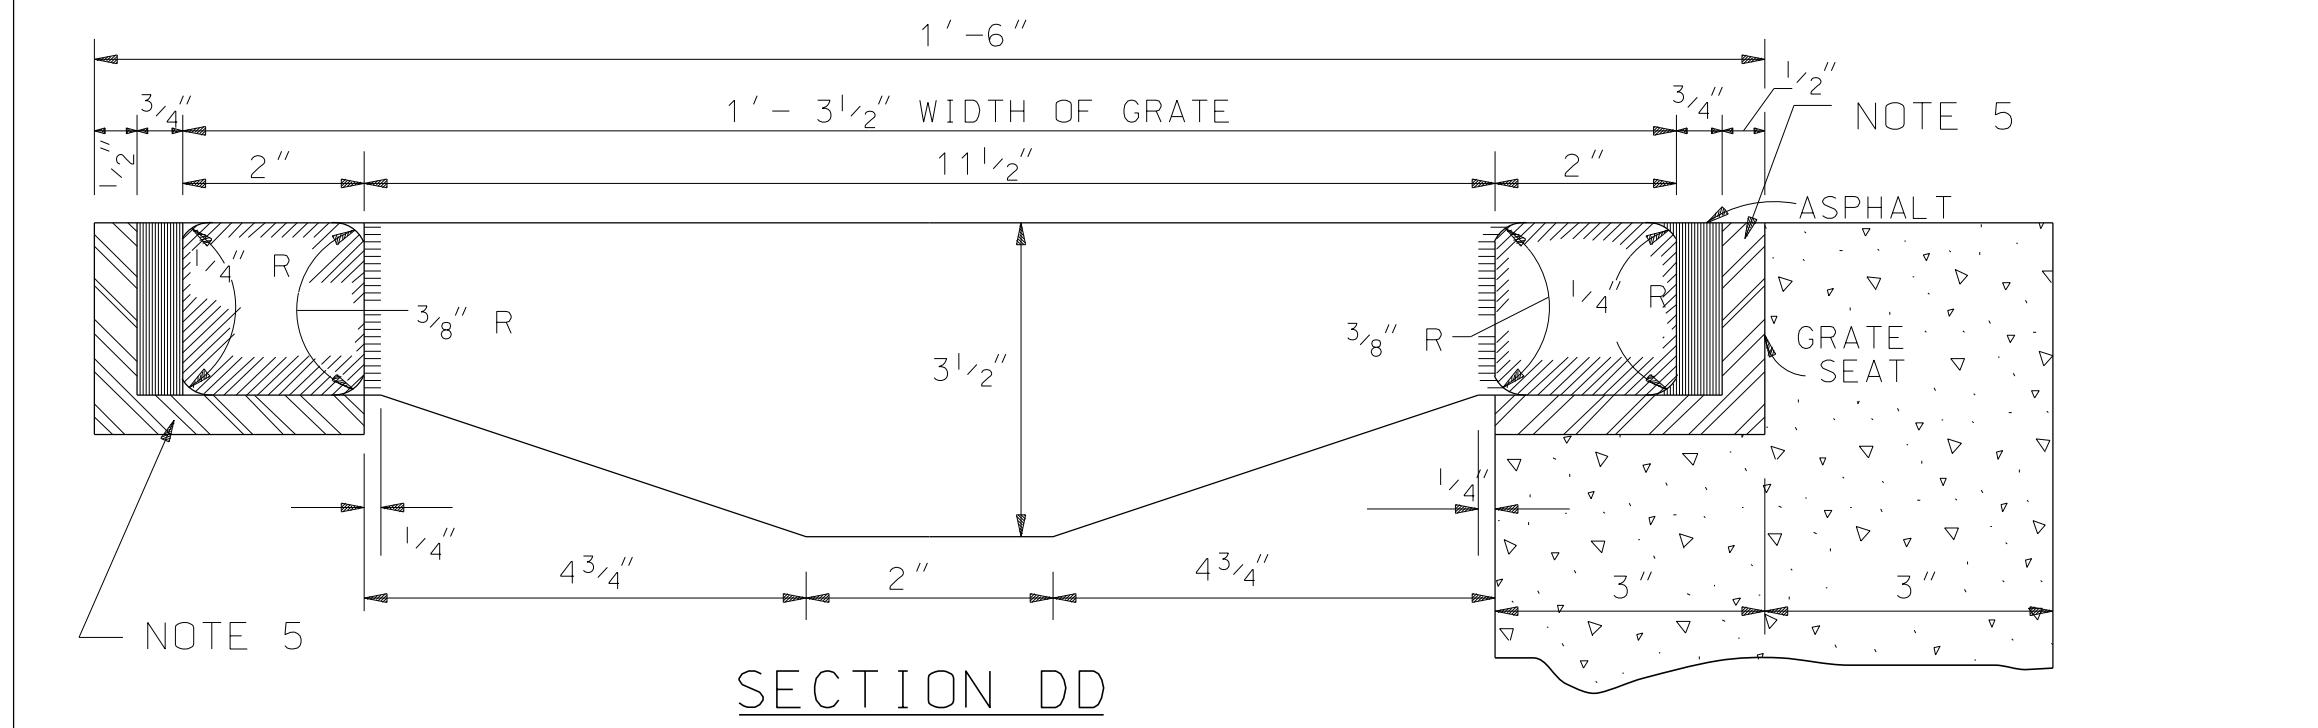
DETAILS OF WELD ON LOWER GRATE (NO. MIG-14)
